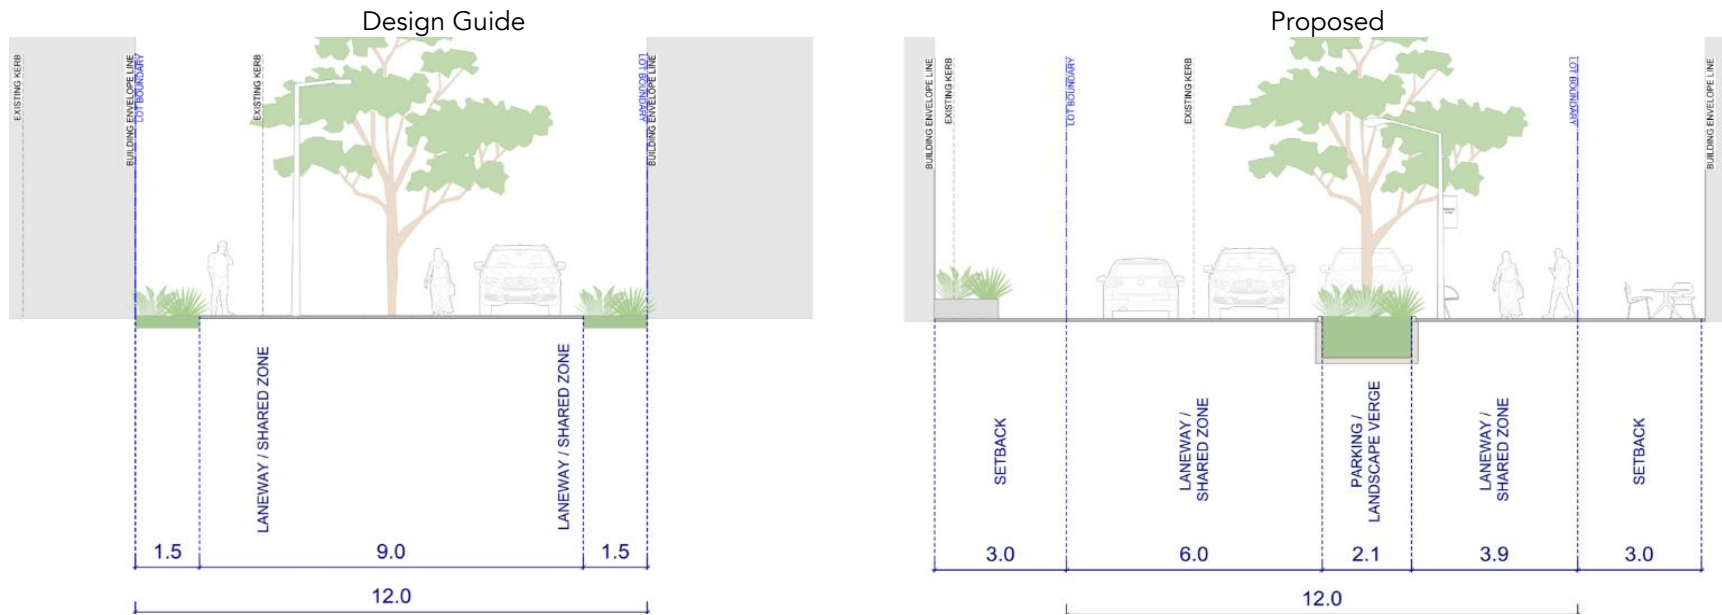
Street Section - Cooper Street South (Aspect Studios)
